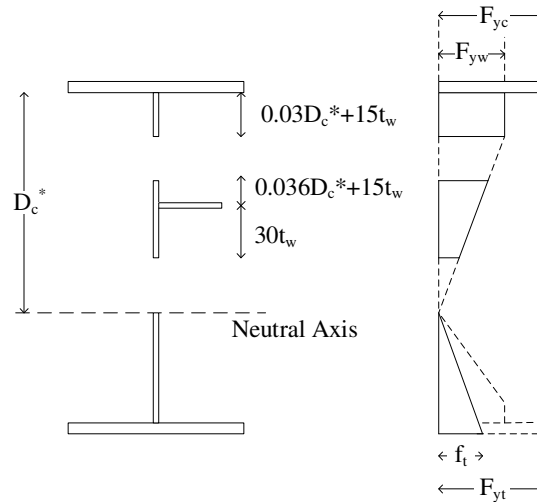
Cross-section model to calculate R_b of longitudinally stiffened girder
